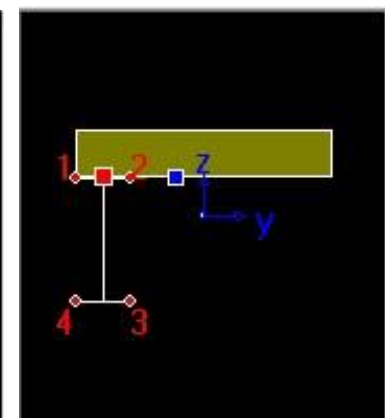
Transverse cross beam Elements between two main girders 40m span
